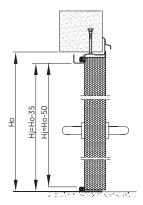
Installation of a single-leaf door with a corner frame without a thermal break to a masonry wall – vertical cross-section
